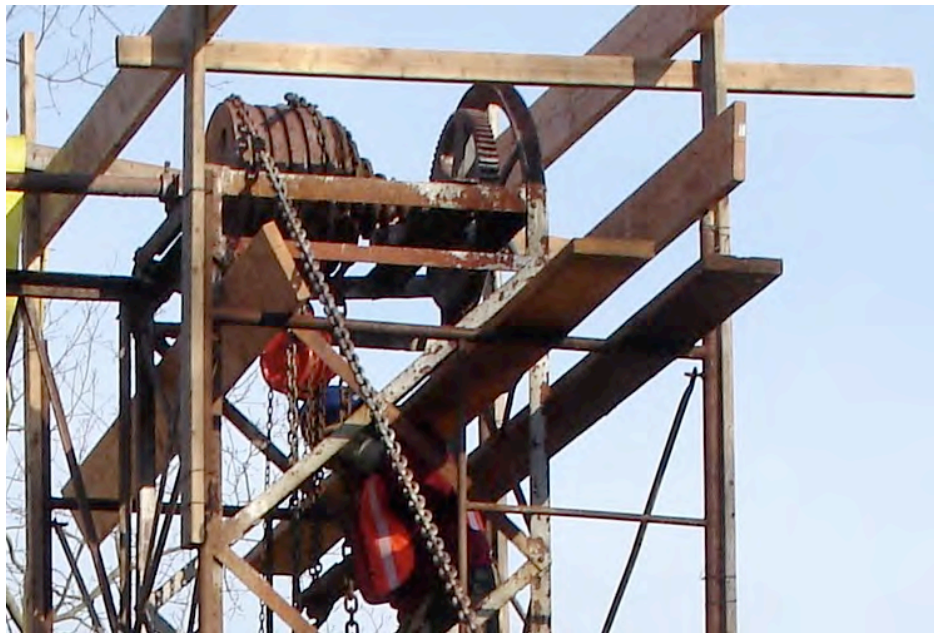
Constant diameter draw chain sheave and spiral cut counterweight sheave mounted on a common shaft
